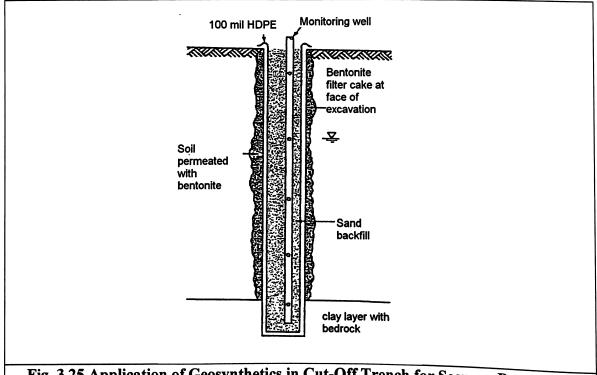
Application of Geosynthetics in Cut-Off Trench for Seepage Prevention
